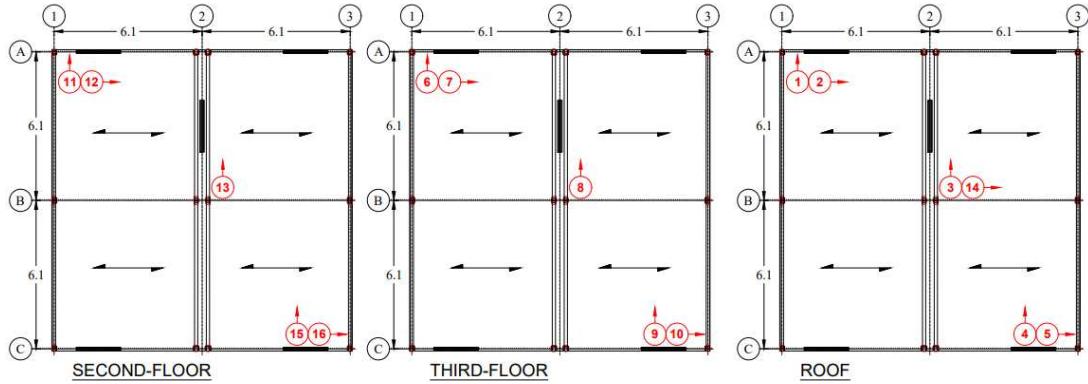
Floor level plans showing approximate locations of the accelerometers marked 1–16.
